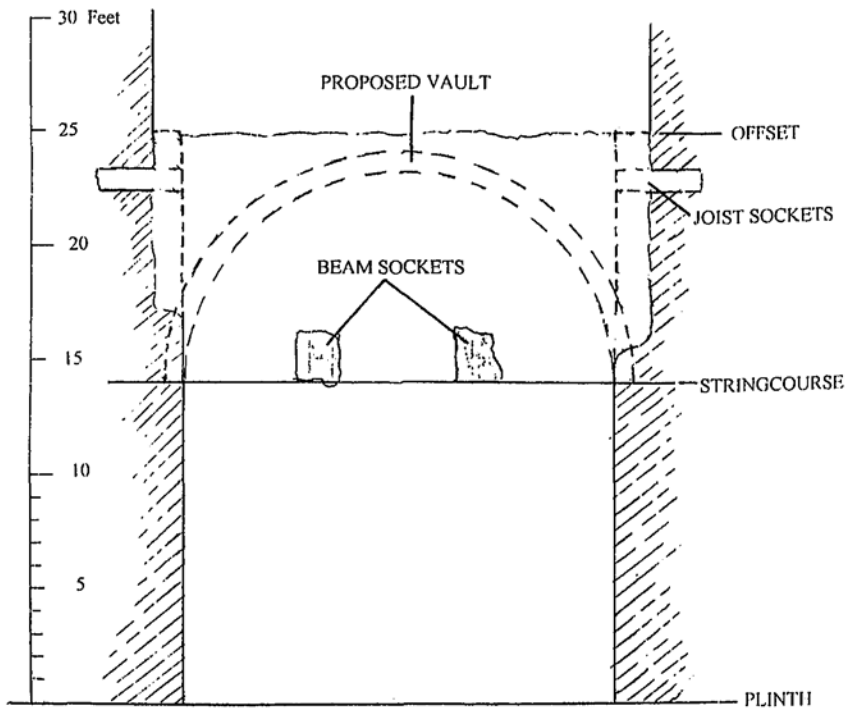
St Leonard's Tower: Section showing proposed vault over the basement.
